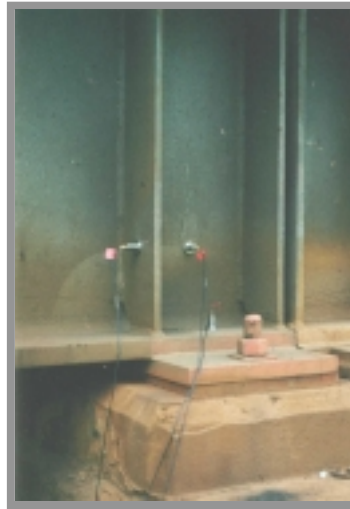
Accelerometers at one of the fixed bearings.
